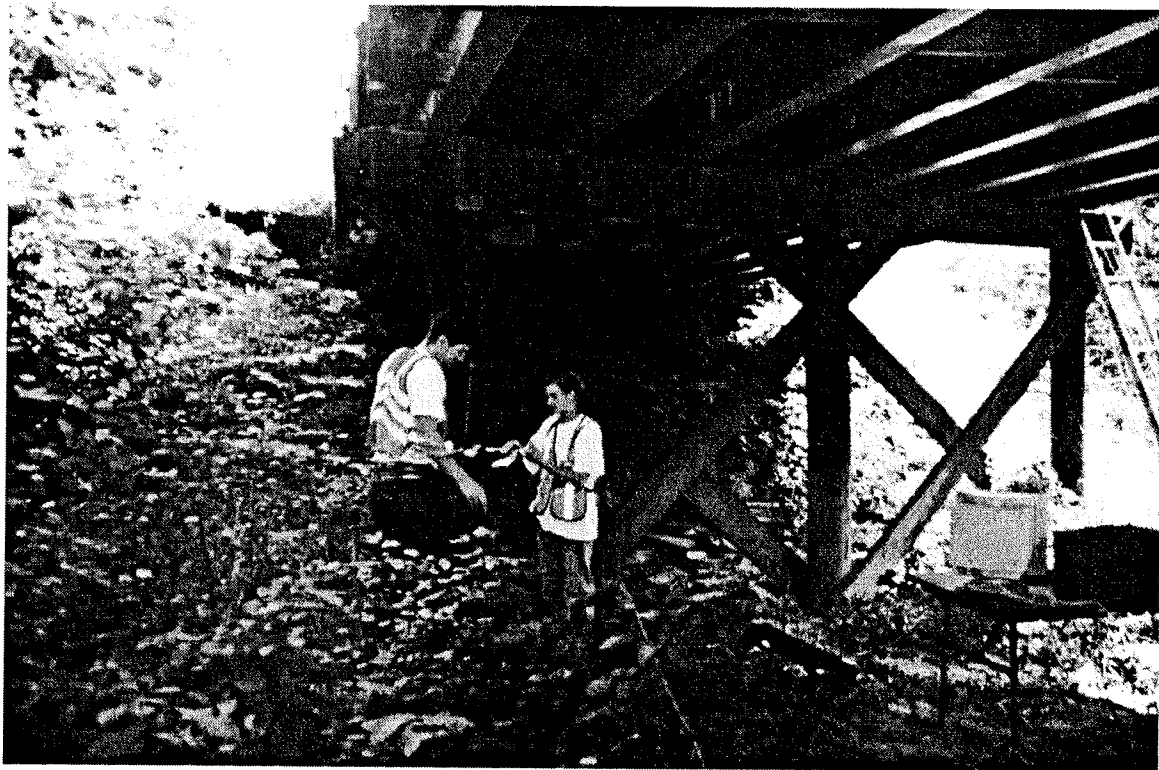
Photograph of Bent 4, Wake County Bridge # 207, North Carolina.
